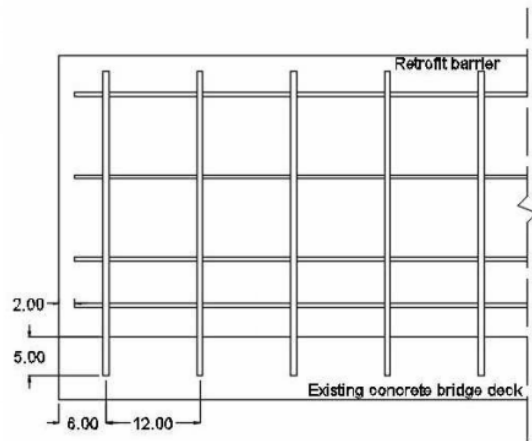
Elevation view of retrofit barrier end region (units of in.)
